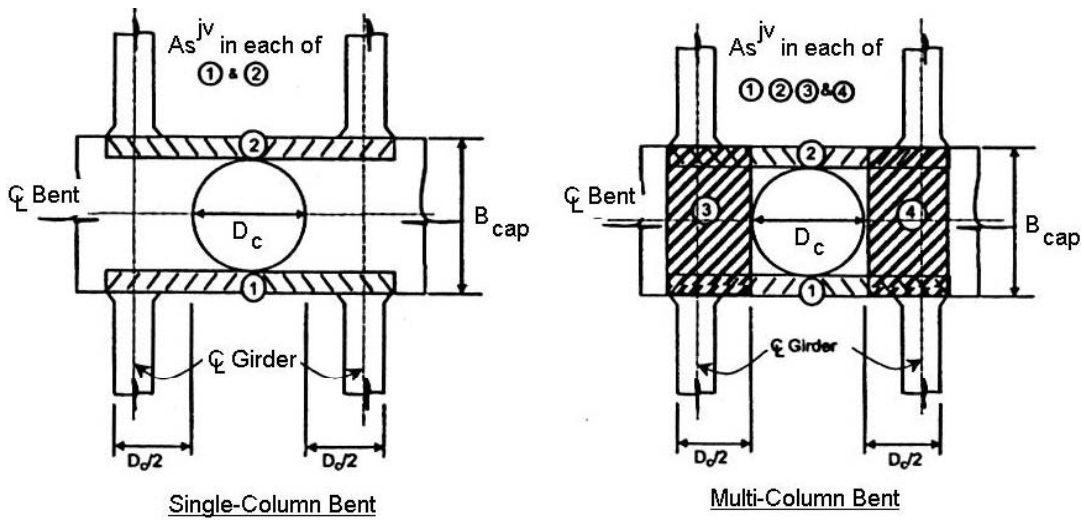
Location of Vertical Joint Shear Reinforcement
